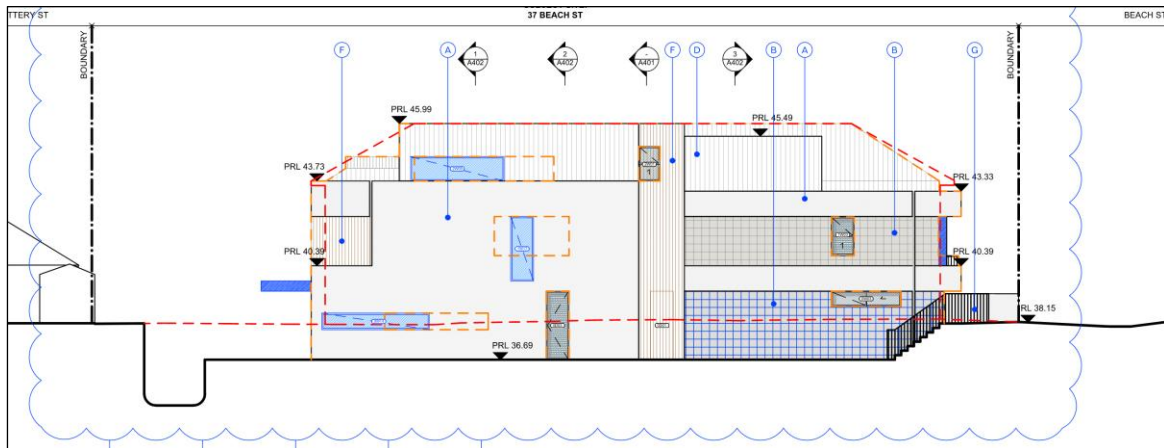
Proposed north elevation (source: Common Office, dated 5/11/2025)
